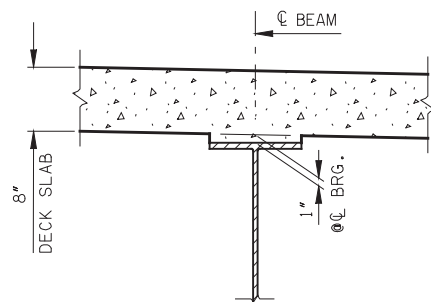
DETAIL SHOWN AT INTERIOR BEAM. OMIT
